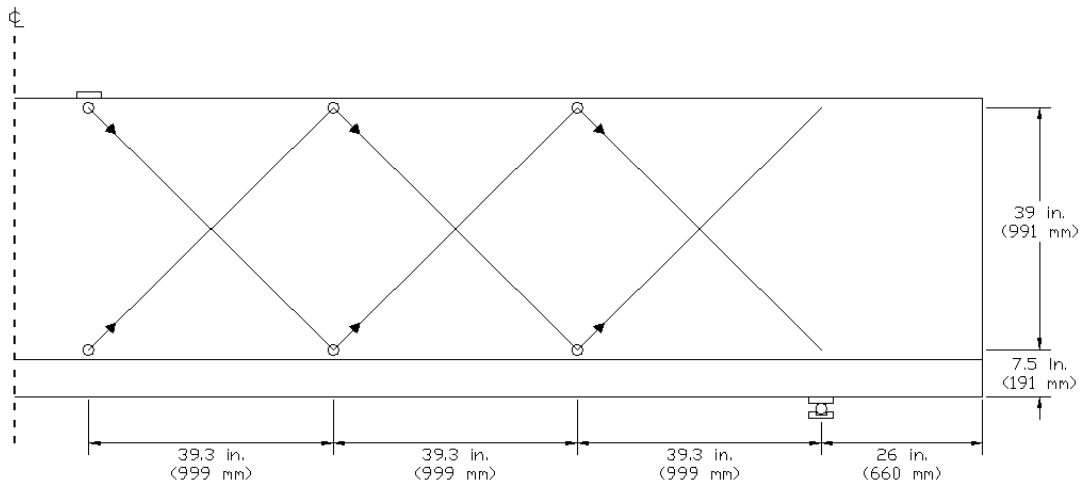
Typical specimen diagonal displacement sensor layout for IT specimens.
